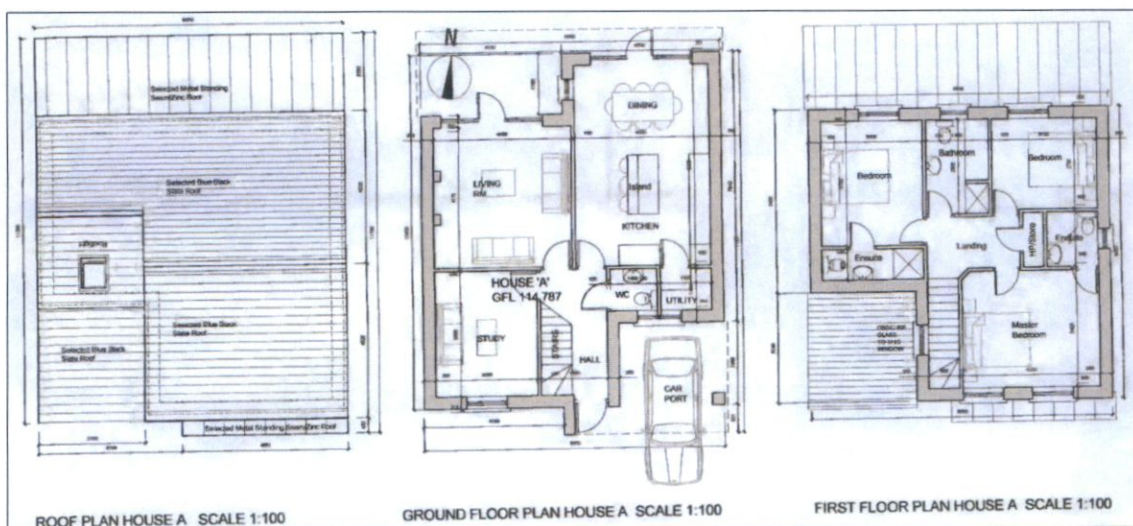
Floor plans of House A as refused under Reg. Ref. SD18A/0138 and ABP Ref.302075-18.
